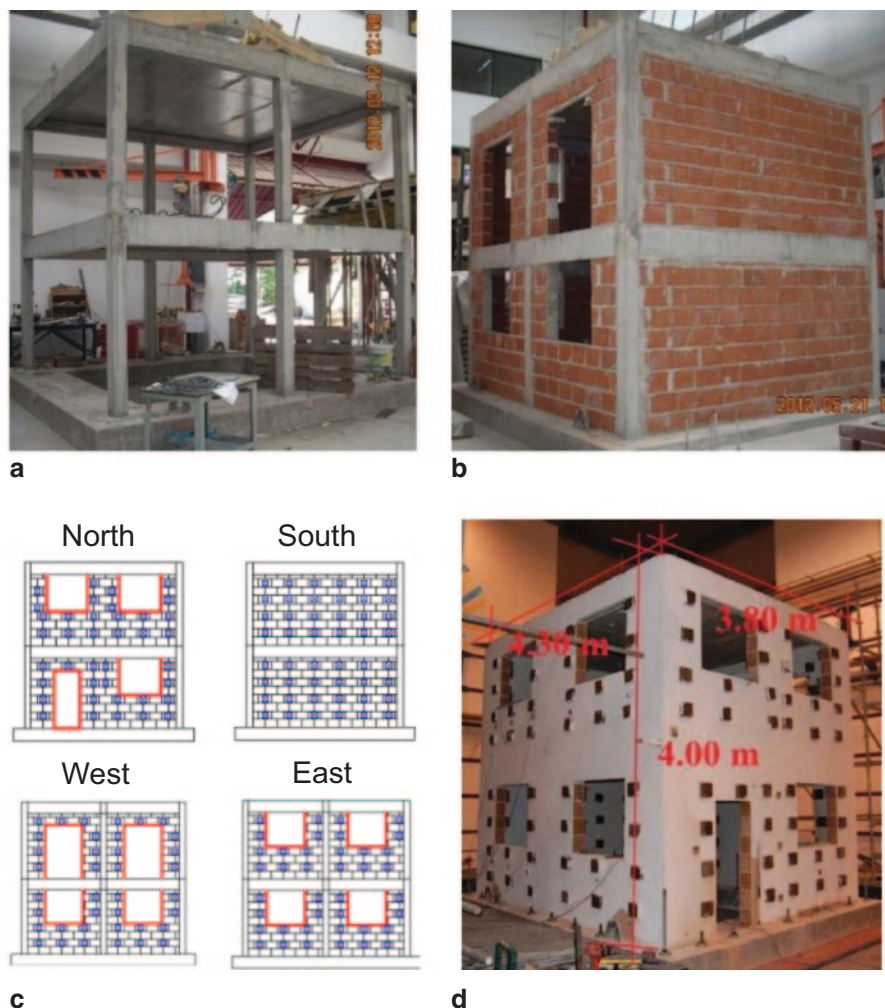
Construction views and geometry of the reduced scale (1:1.5) building model
